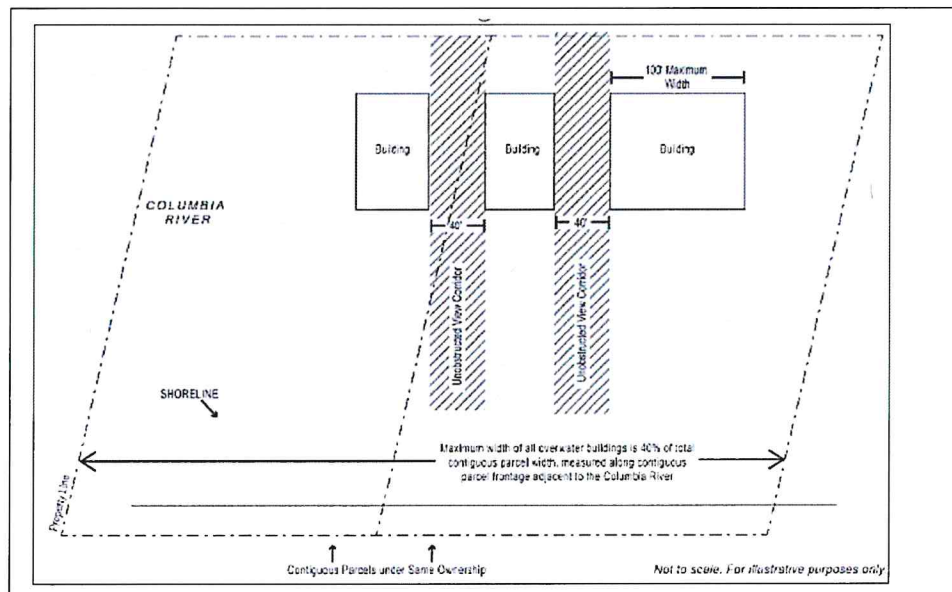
4: Maximum Building Width Required for Added Structure Height
